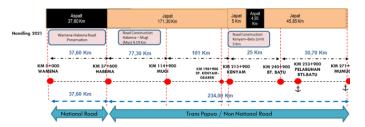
Handling of the Wamena – Habema – Kenyam – Mumugu Road
